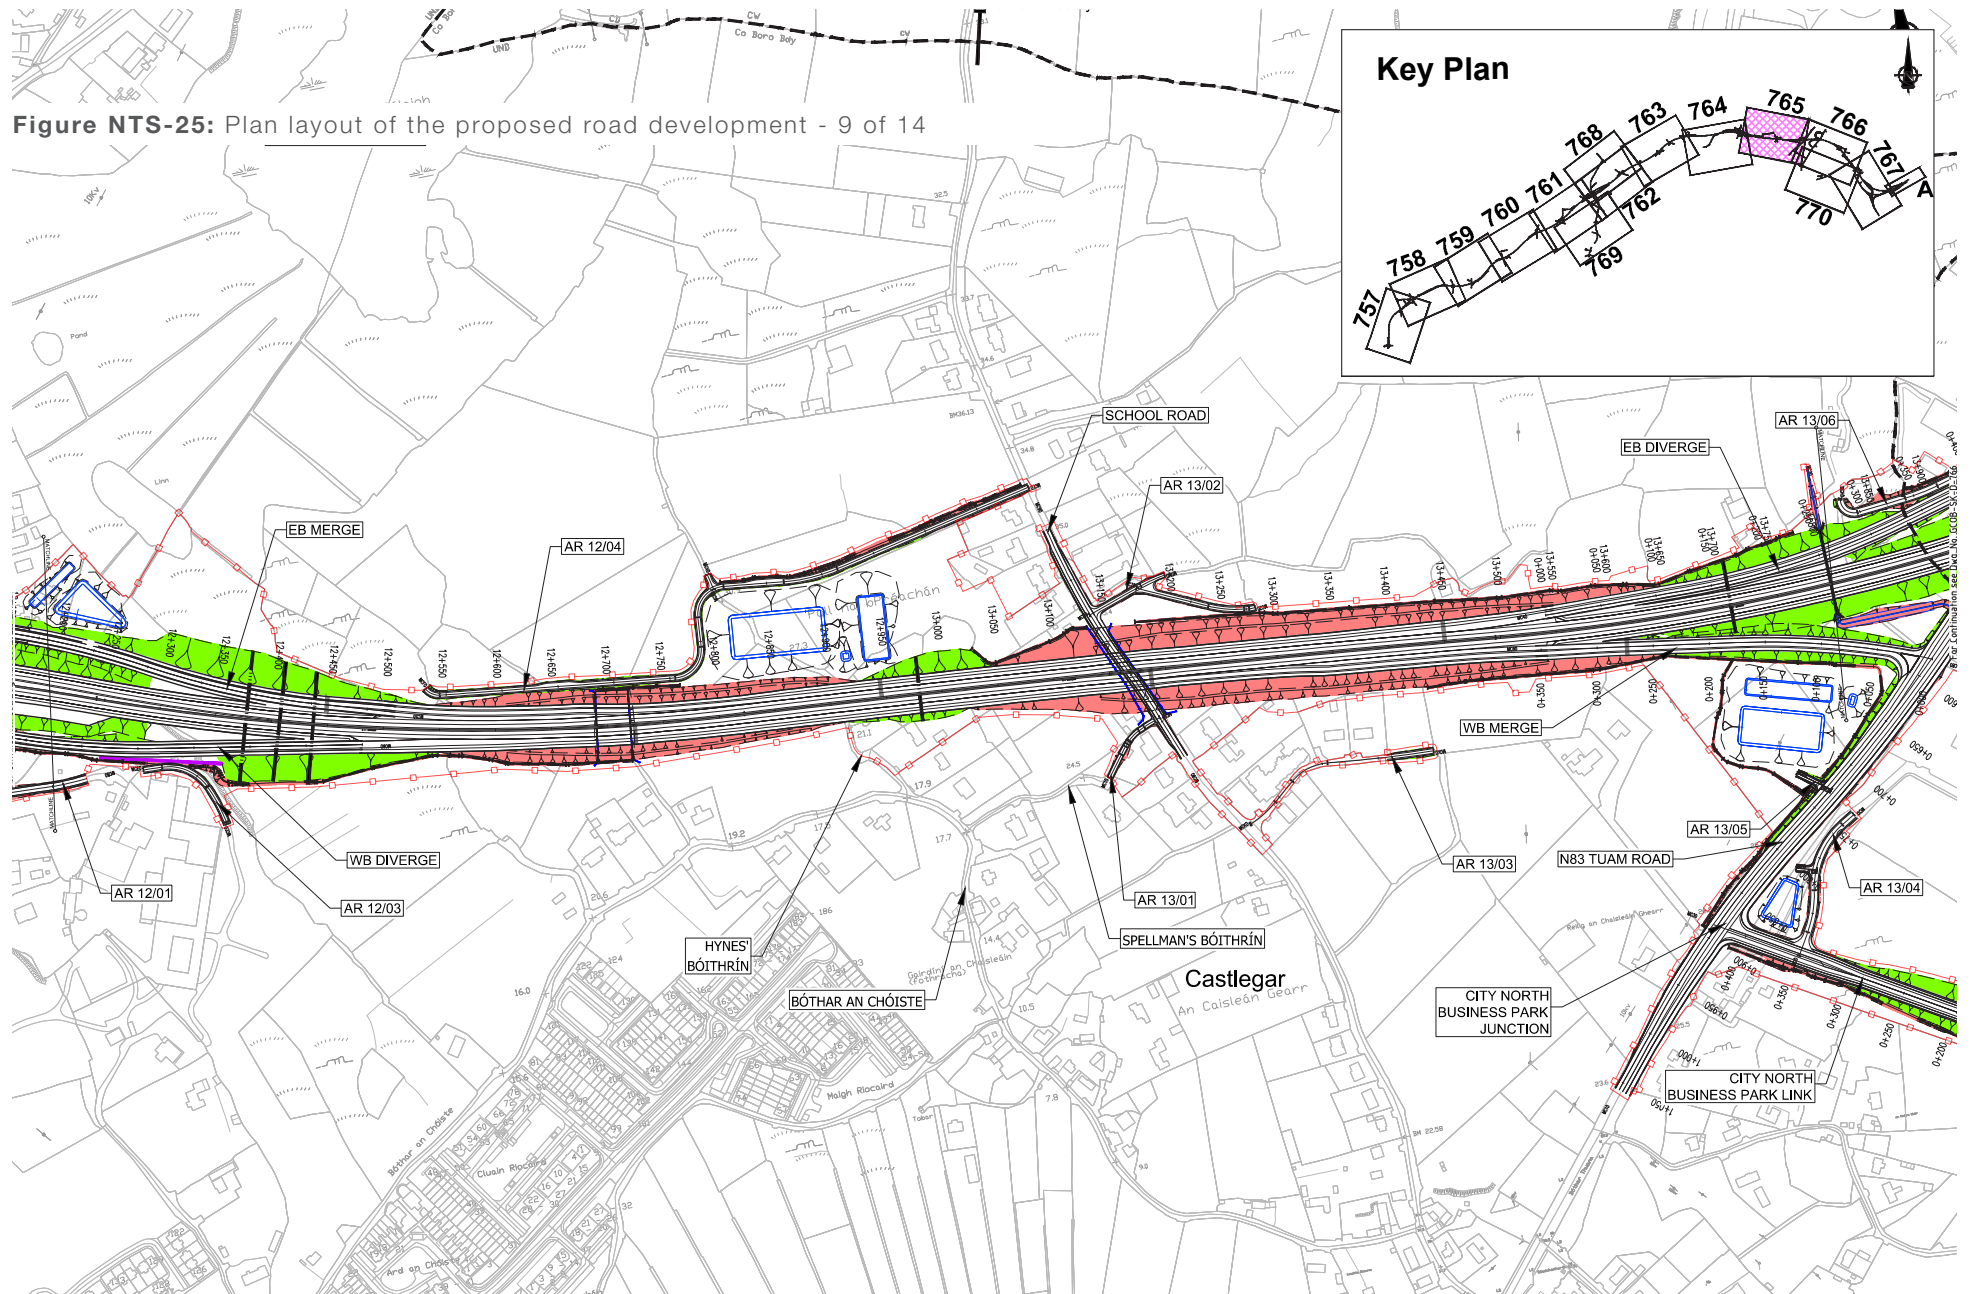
Plan layout of the proposed road development - 9 of 14
